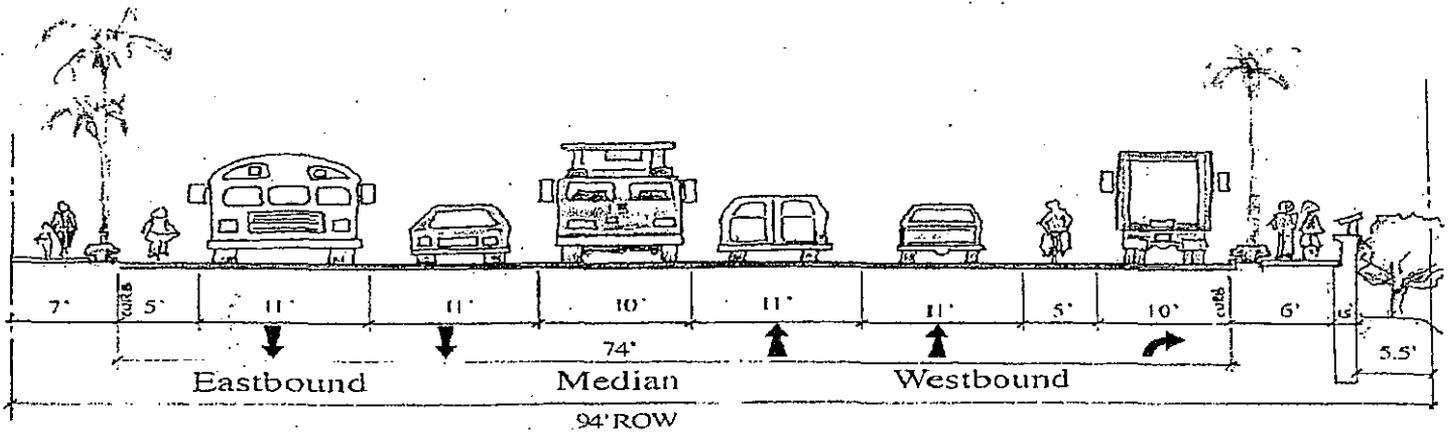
Torrey Pines Road, 200' East of Prospect Place
